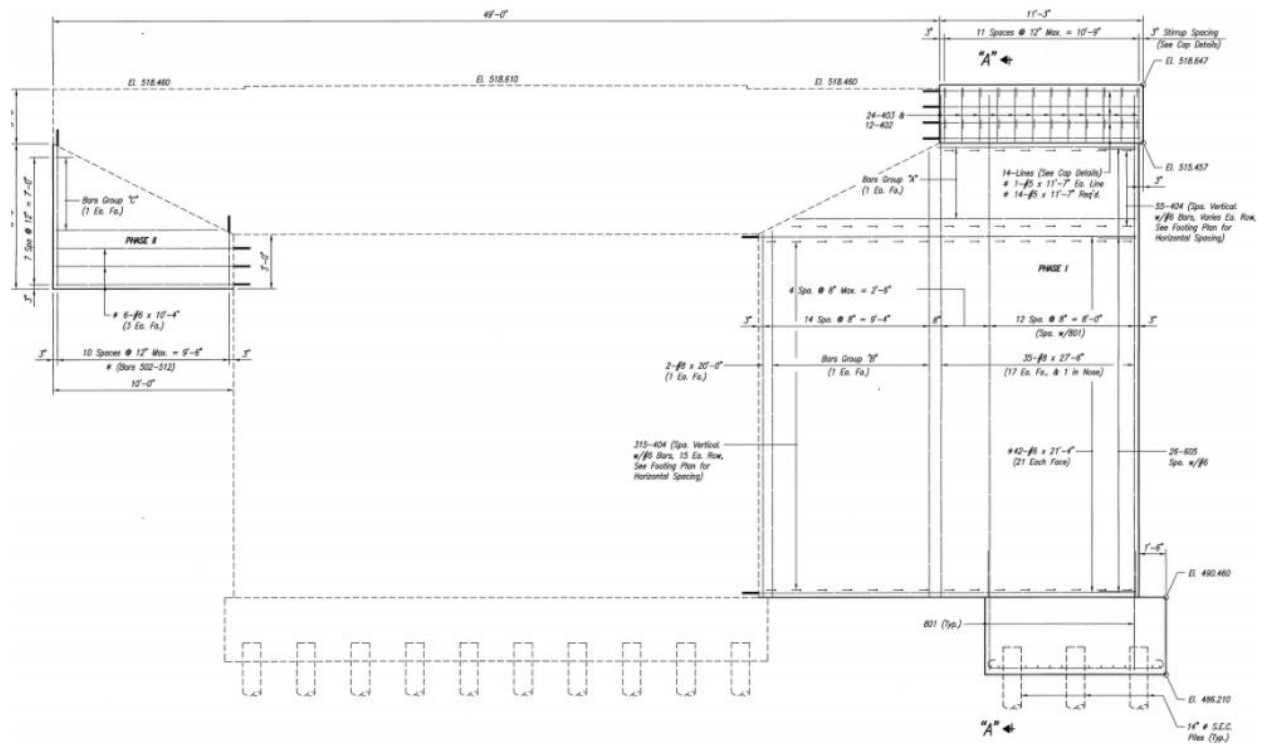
Transverse Elevation of Interior Pier (NBI 41230) (2015)
